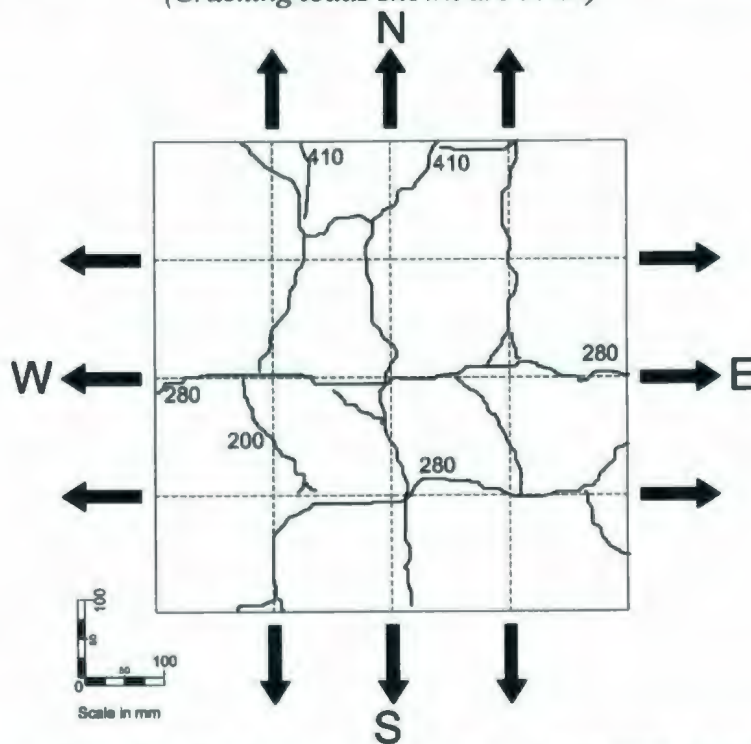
Stabilized crack pattern of panel P12-SNB-16-1.0-2.5
